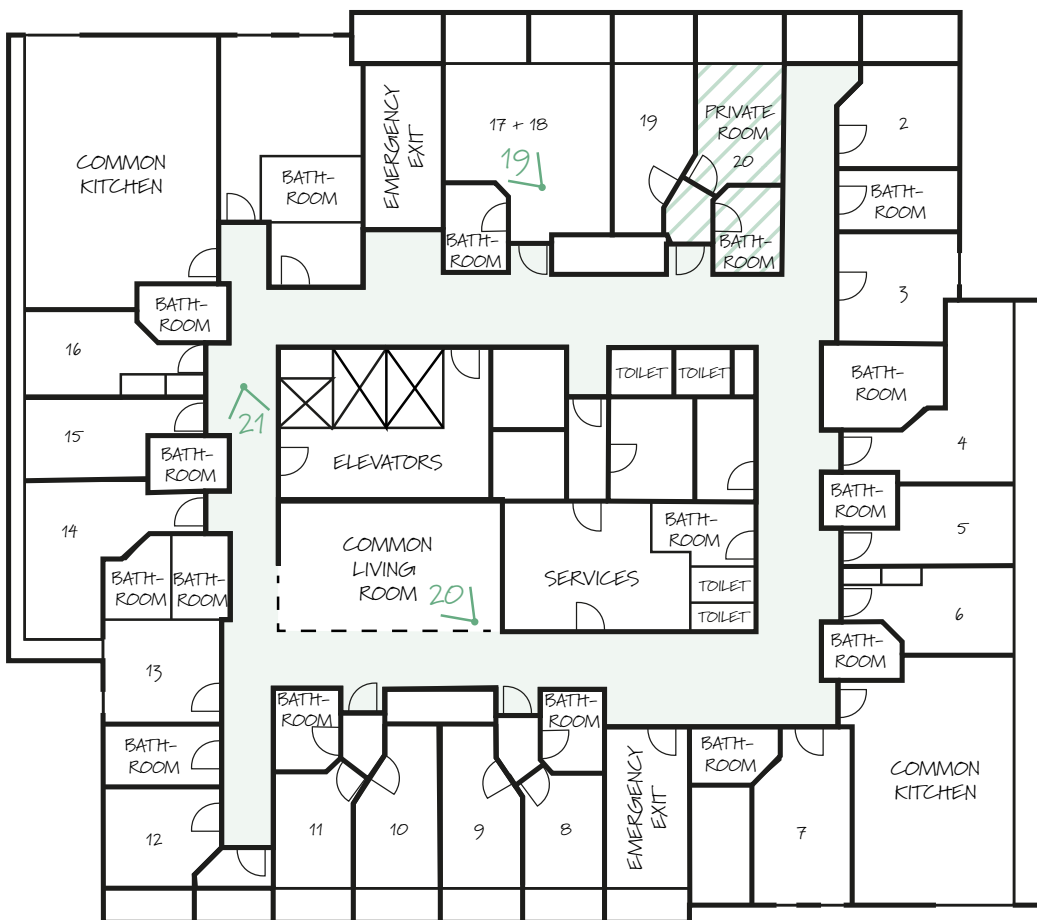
Visualisation of department floor plan closed facility, own sketch (2023).
